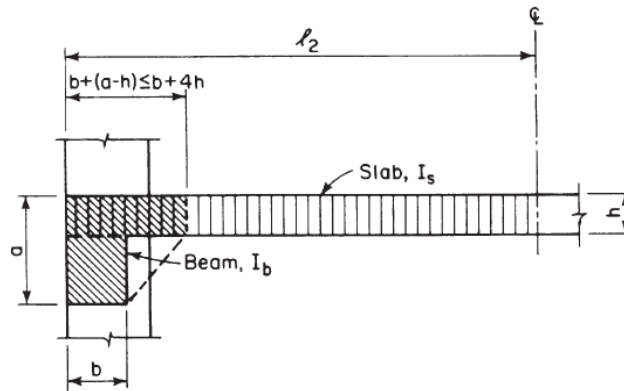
Effective Beam and Slab Sections (Edge Beam)
